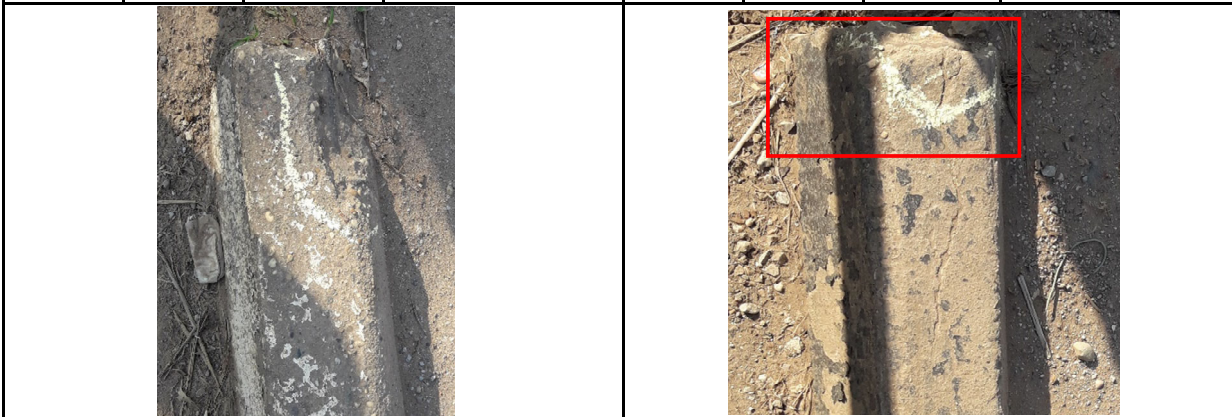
Component	On the road	Photo No.	092	Component	On the road
